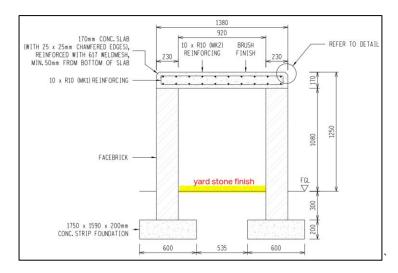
Excerpt showing the protected corner/edge detail of exposed external concrete slabs
